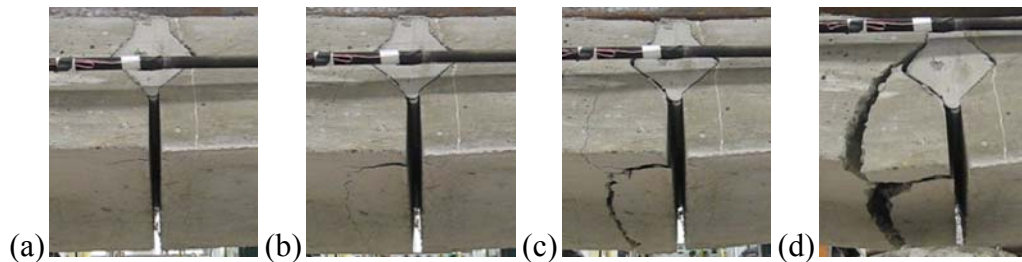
Flexural welded stud tested cracking sequence.
